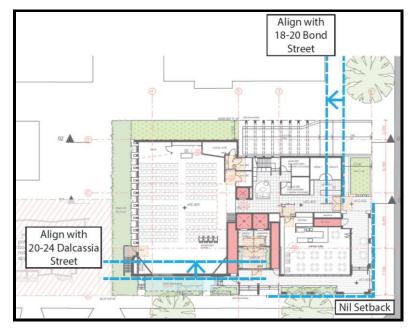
Proposed Setbacks (Source: GMU Urban Design and Architecture, 17/12/20)
